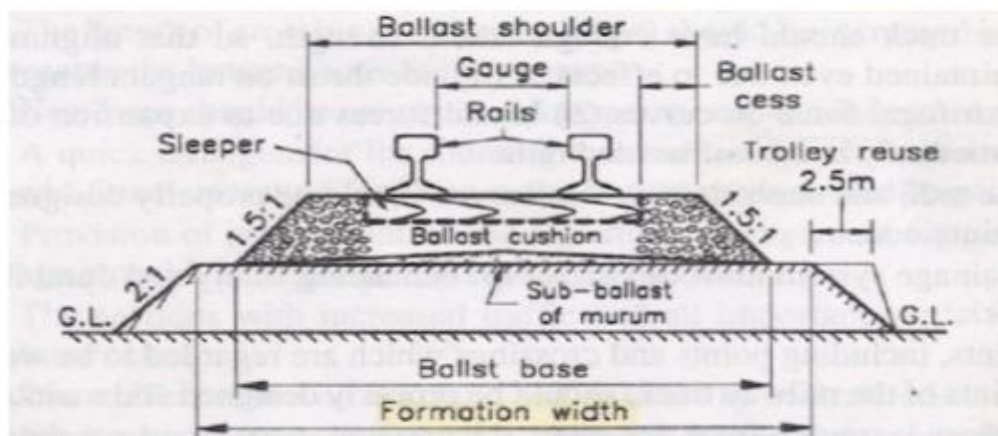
Typical Cross-section of a Permanent Way on Embankment.
